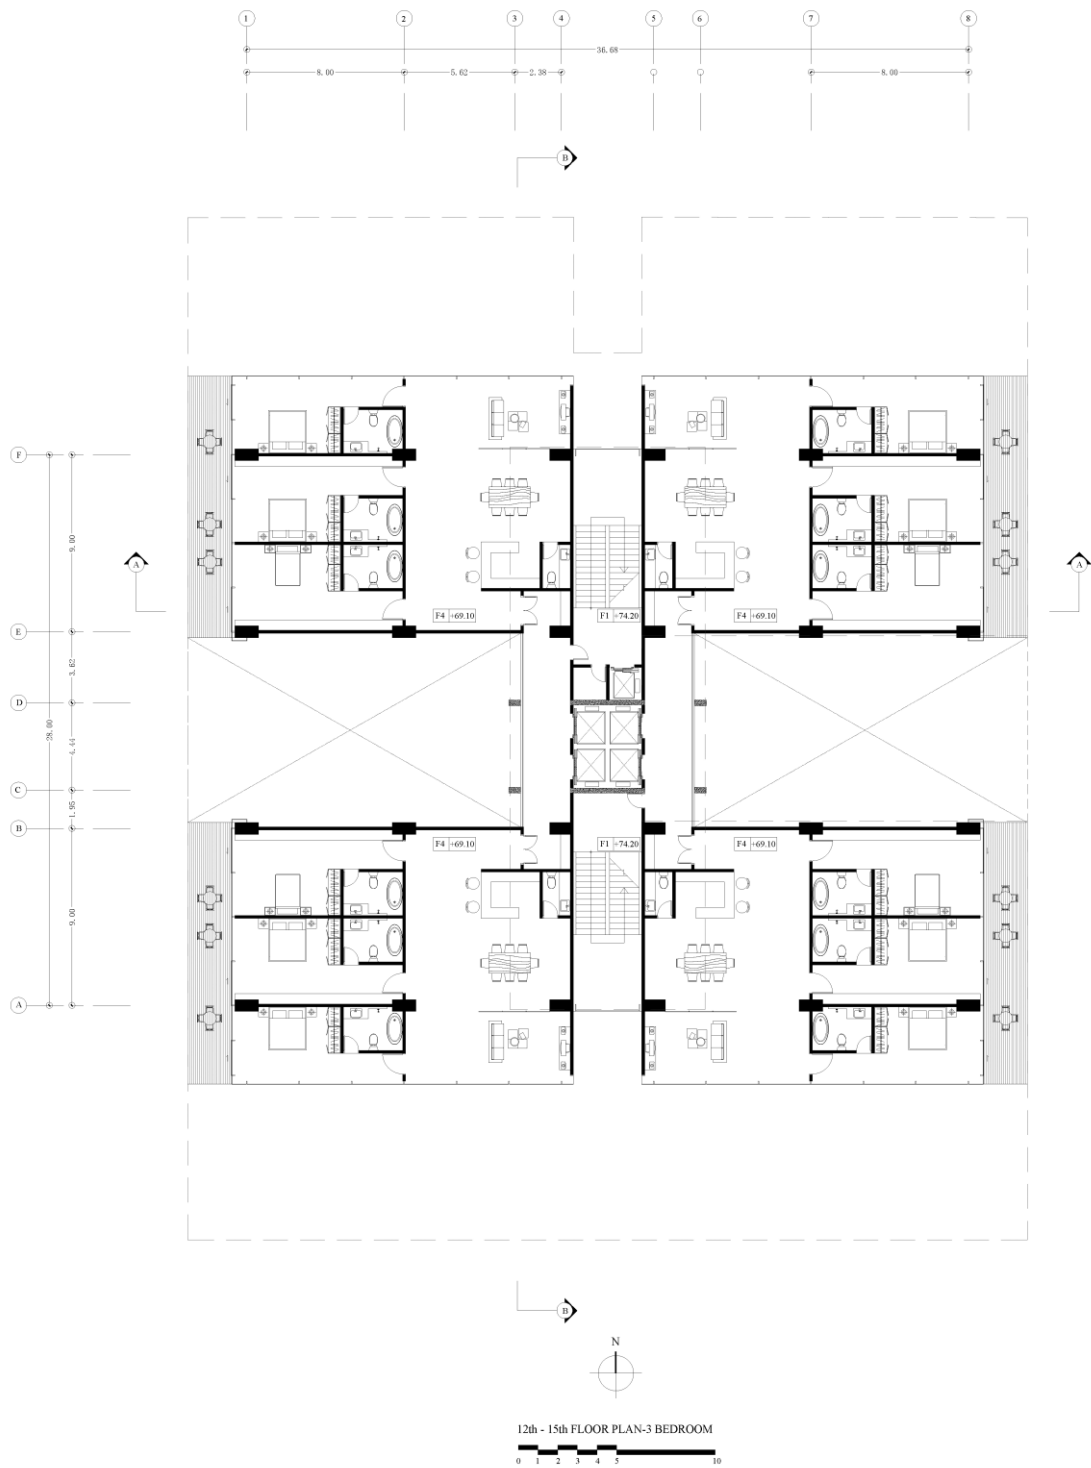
12th to 15th Floor Plan: Three Bedroom Unit, drawn by the author.
